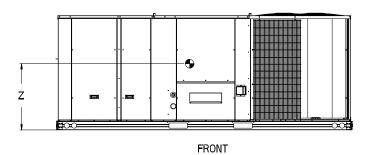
Unit Dimensional Drawing: 17.5 Ton RAS210/213
